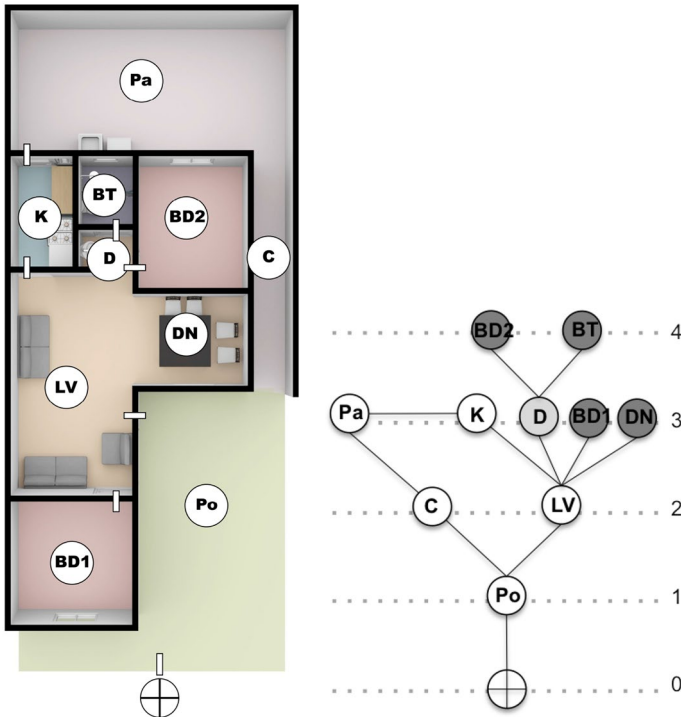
Original CR1 annotated floor plan and JPG, with the exterior as the carrier
